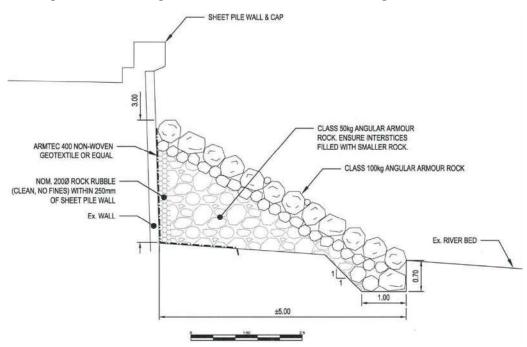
Riprap buttress cross section along the Anderton Avenue Dike sheet pile wall section (McElhanney, 2016)
